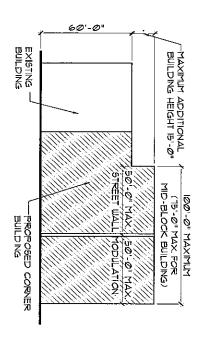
Maximum horizontal distance for buildings over 60 feet high.
